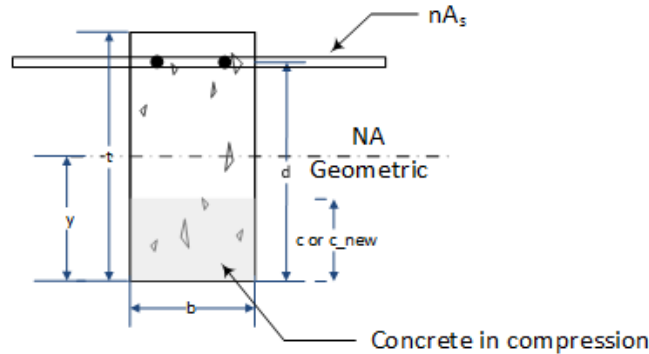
Transformed Cracked Section for Mechanical Load Case and Final Load Case
